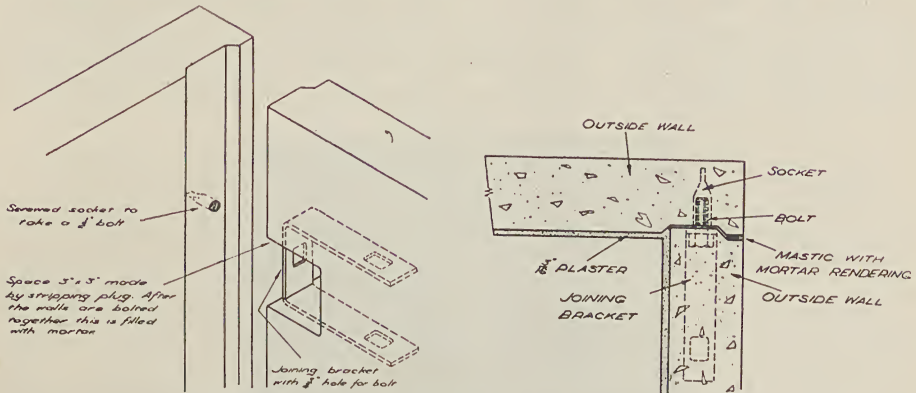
METHOD OF JOINING LARGE PRECAST SLABS.
